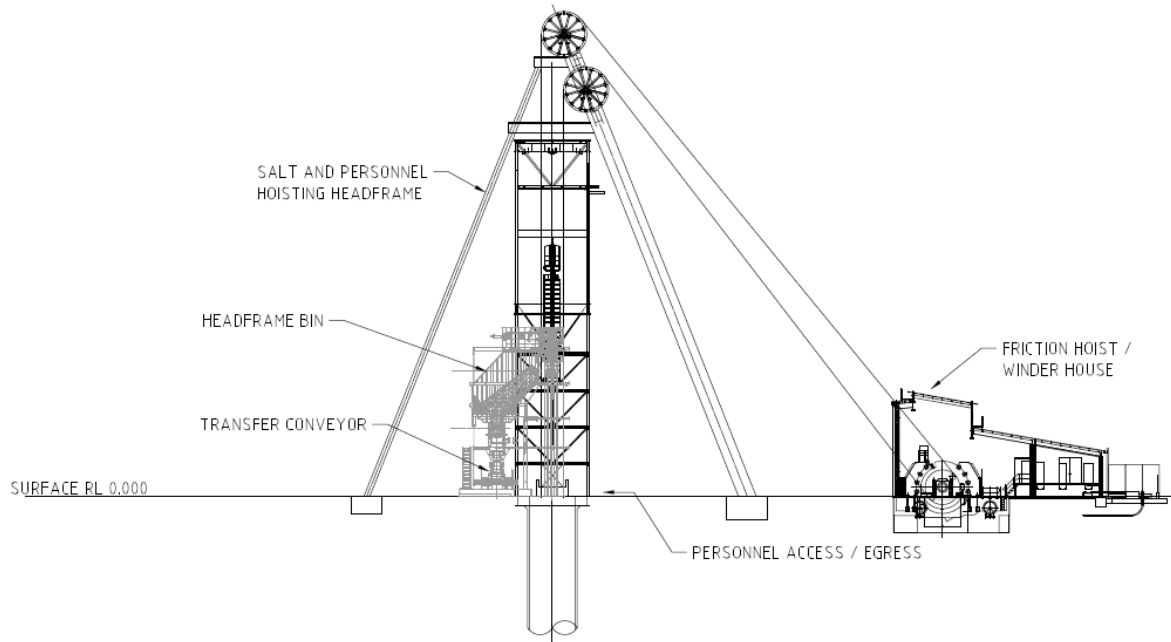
Example of main shaft headframe structure (Chandler Facility)
